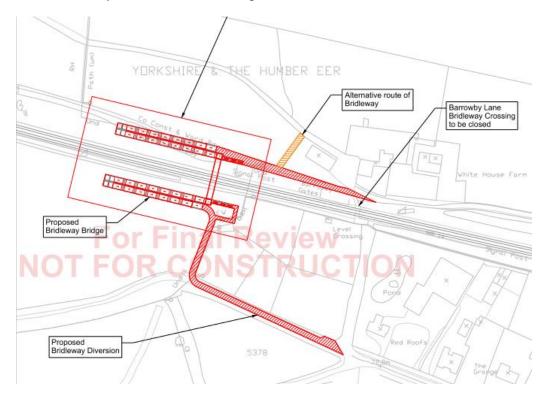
Option 1 - New ramped bridleway bridge at Barrowby Lane Level Crossing
